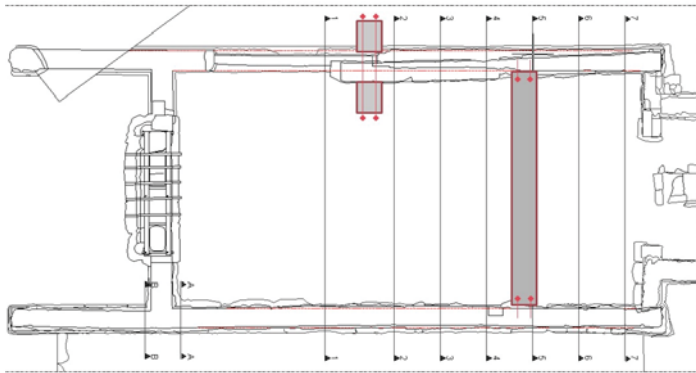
Structural steel cross-braced walls to support the walls of the Augustus Temple
